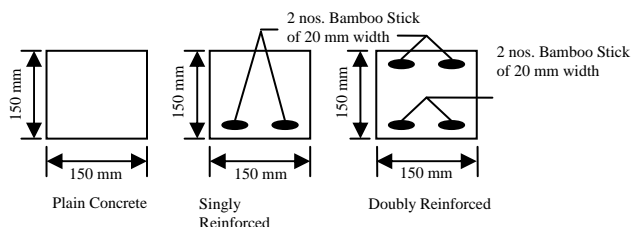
Cross-Section of Sample Concrete Beam with and without Bamboo Reinforcement
